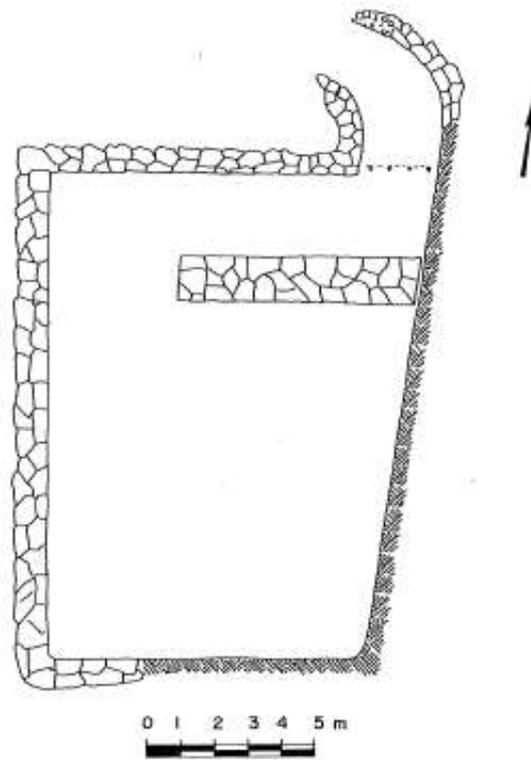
Plan of house I at Wattens (after Kasseroler 1957, Taf. 2).
